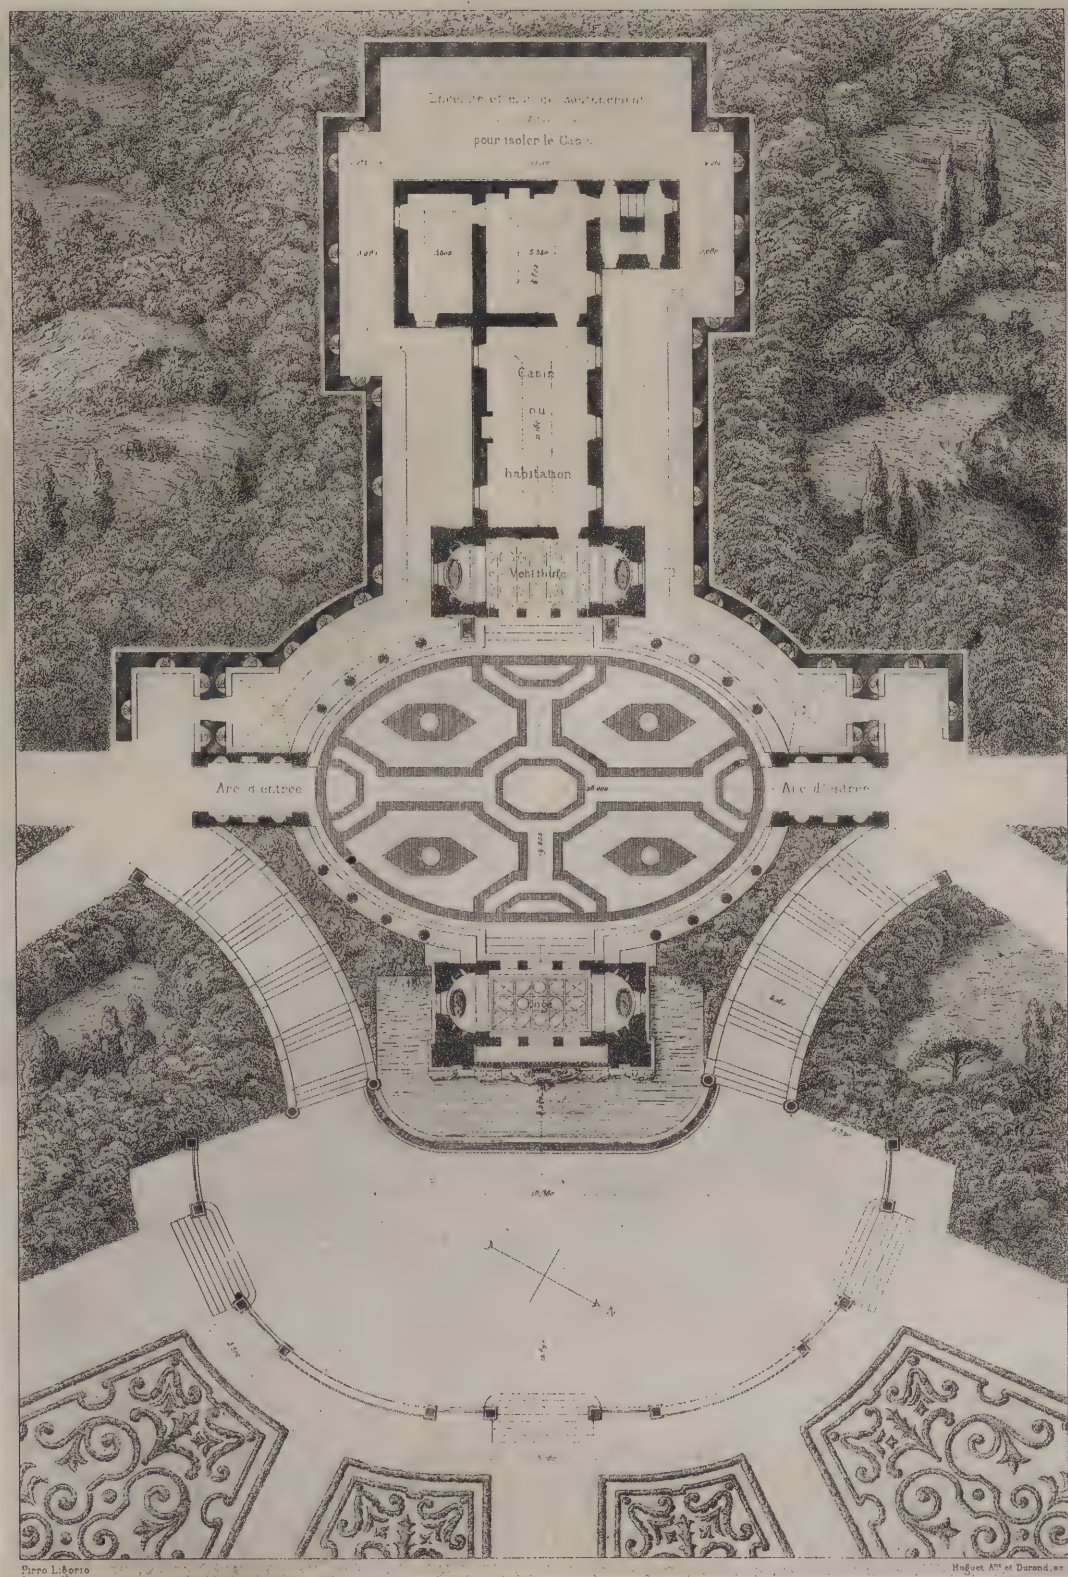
Plan of the Villa Pia in the Vatican Gardens, Rome. From Letarouilly's "Vatican."
